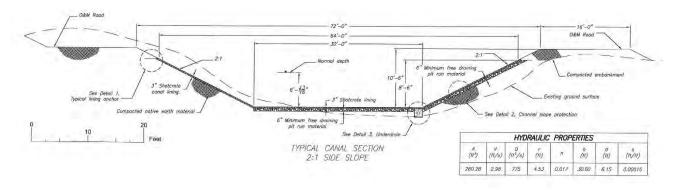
USBR Typical Canal Liner Cross Section
